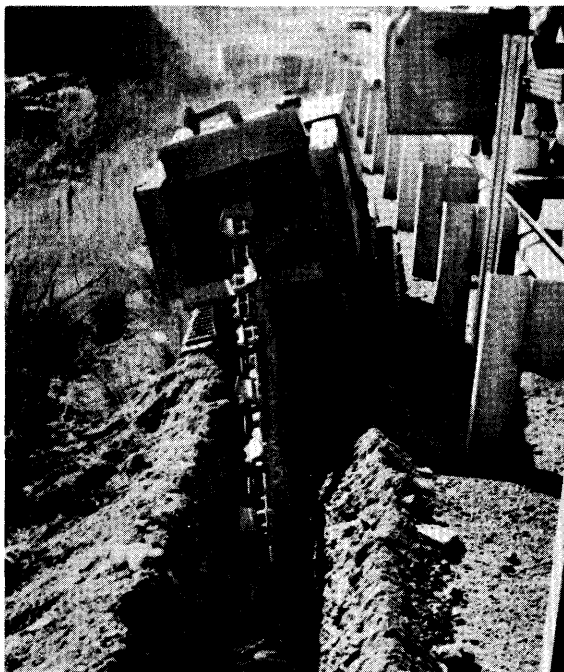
Trenching for placement of conduit. Trench depth was a minimum of 18 inches (457 mm).
